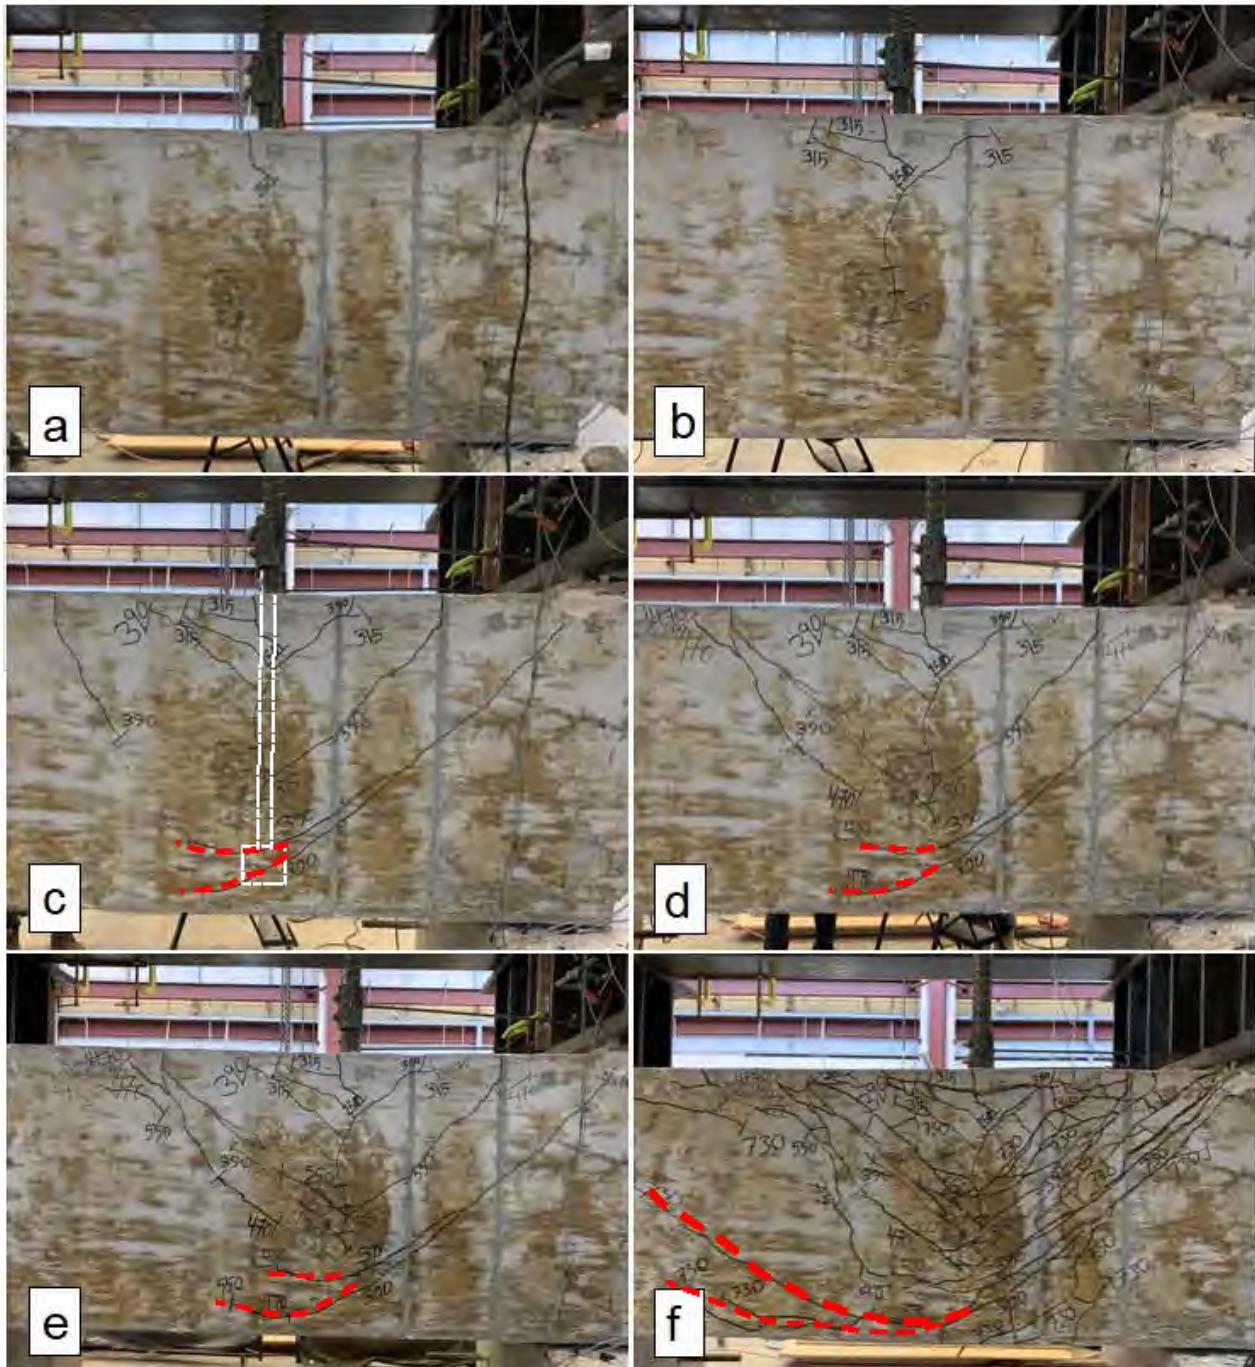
Example of cracking pattern in headed bar specimens (side face, specimen 18-3): (a) Vertical crack likely initiating due to bar slip, (b) Cracks branching towards bearing members, (c) First diagonal crack due to shear in joint, (d) and (e) Cracks propagating throughout the joint, (f) Cone-shaped cracking pattern after failure. (Note: Extension of diagonal cracks along the back face of the specimen towards the top of the column are marked by dashed lines.)
